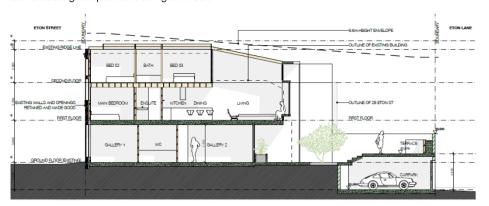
Plan extract section AA DA07(A) showing compliance with the 9.5 metre height of building standard
